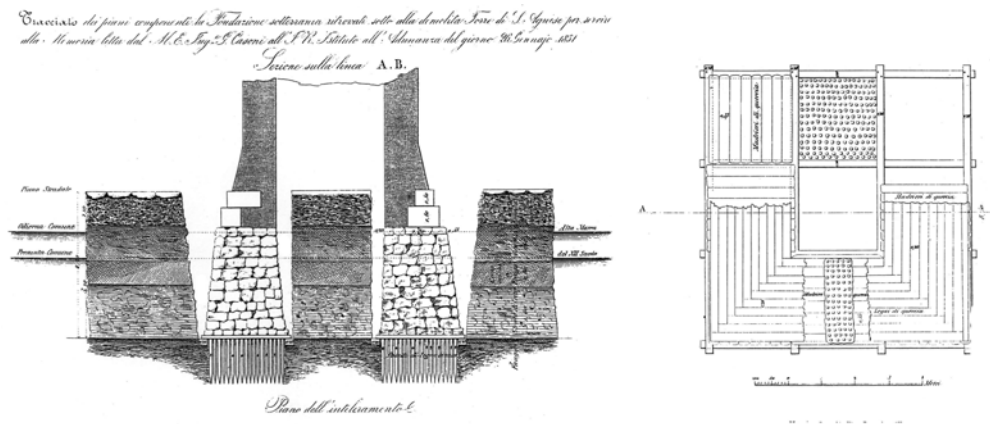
Section and plan view of the foundation of Sant'Agnese bell tower (from [Casoni (1851)]).
